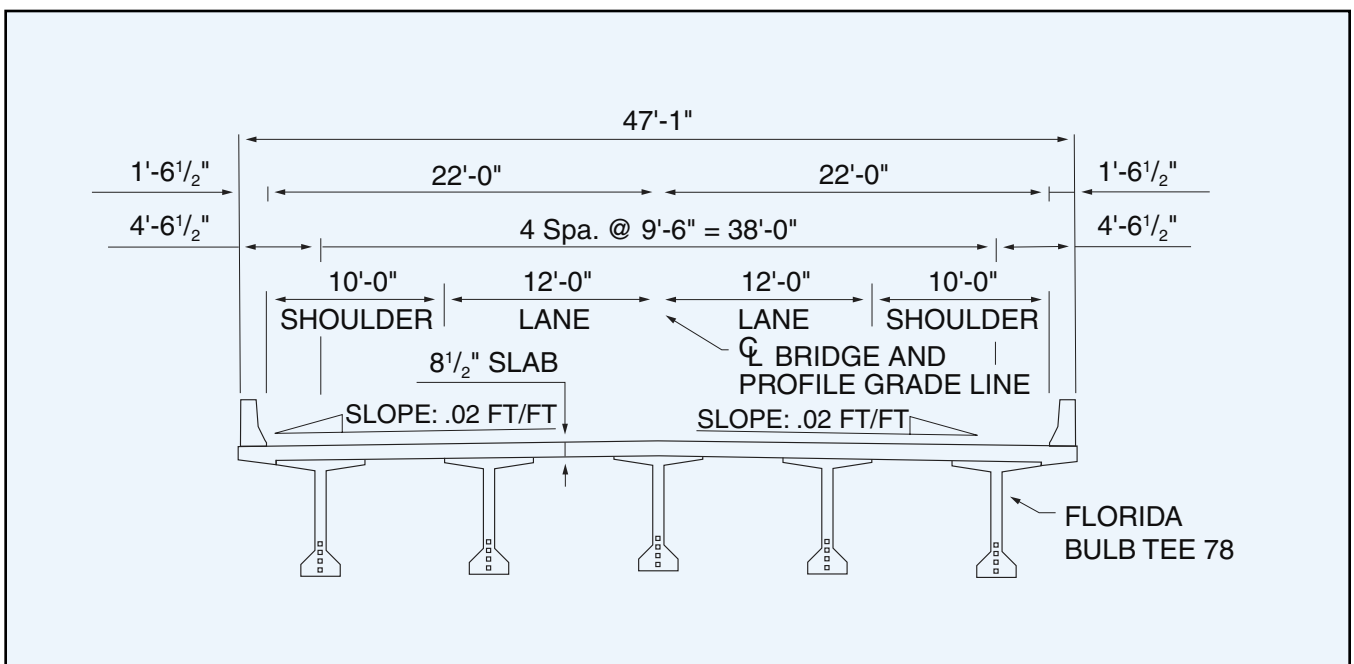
Typical section of high level portion of St. George Island replacement bridge. Note: 1 ft = 0.305 m; 1 in. = 25.4 mm.
